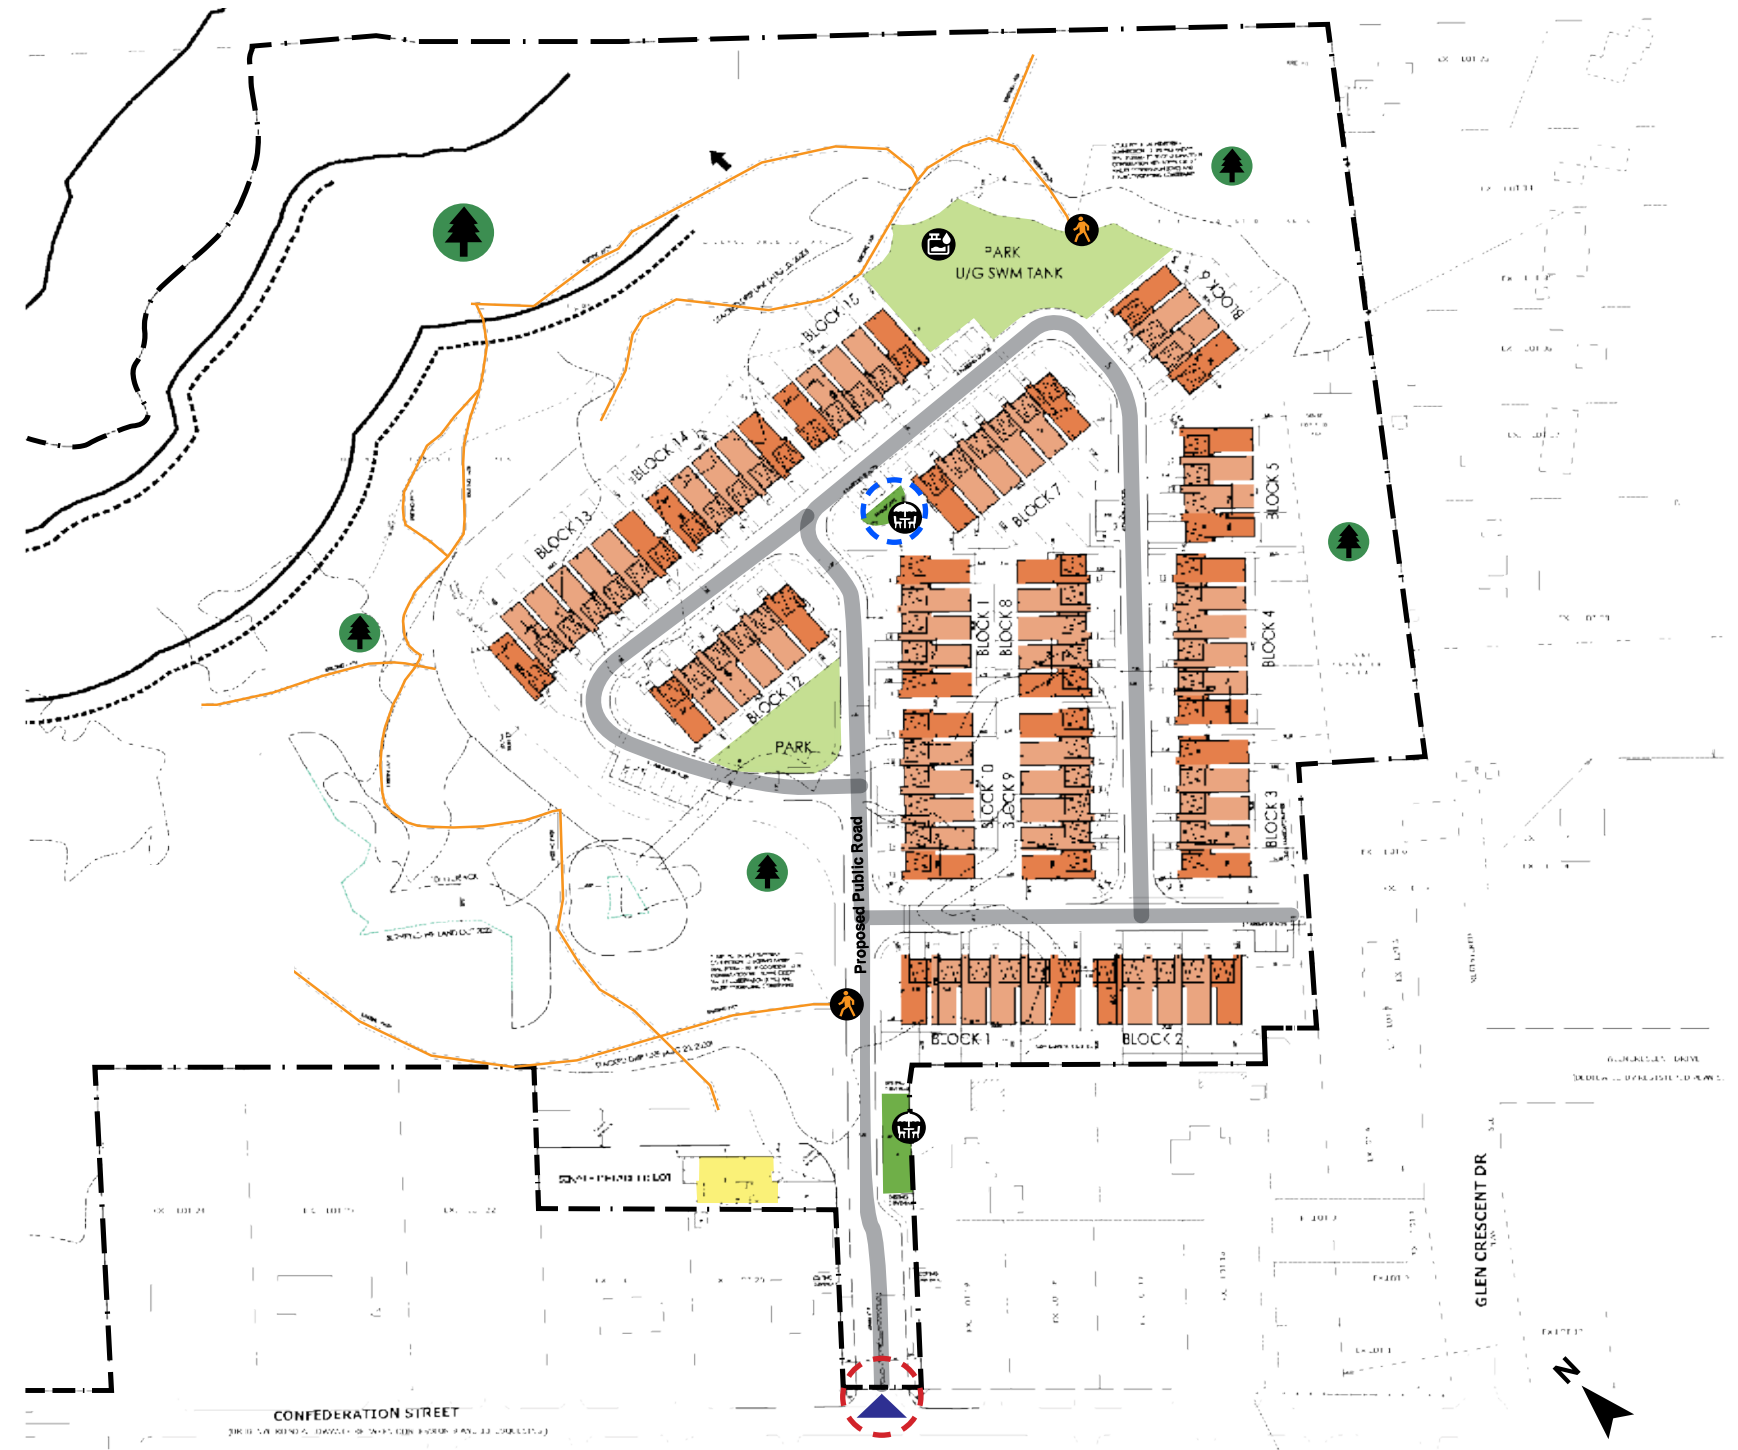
Site Organization Diagram - Site Plan Prepared by RN Design and Annotated by Weston Consulting
